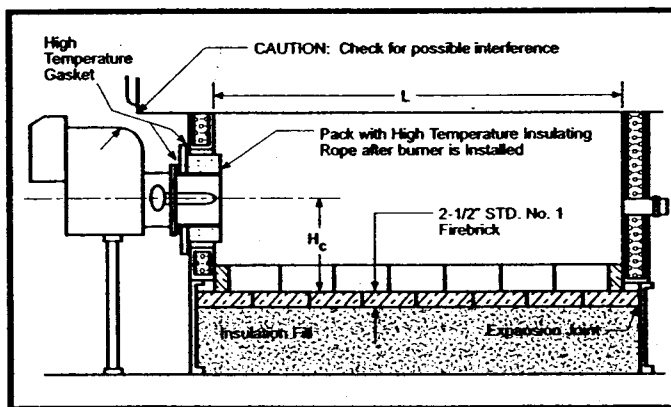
Type "R" Burner Installation Firing Firebox Boiler through the Door
